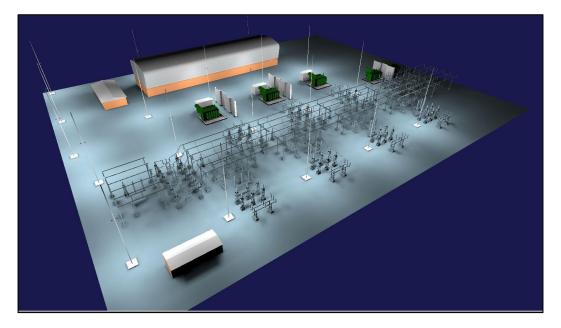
Ystervark Substation - Outdoor Lighting 3D Illustration
